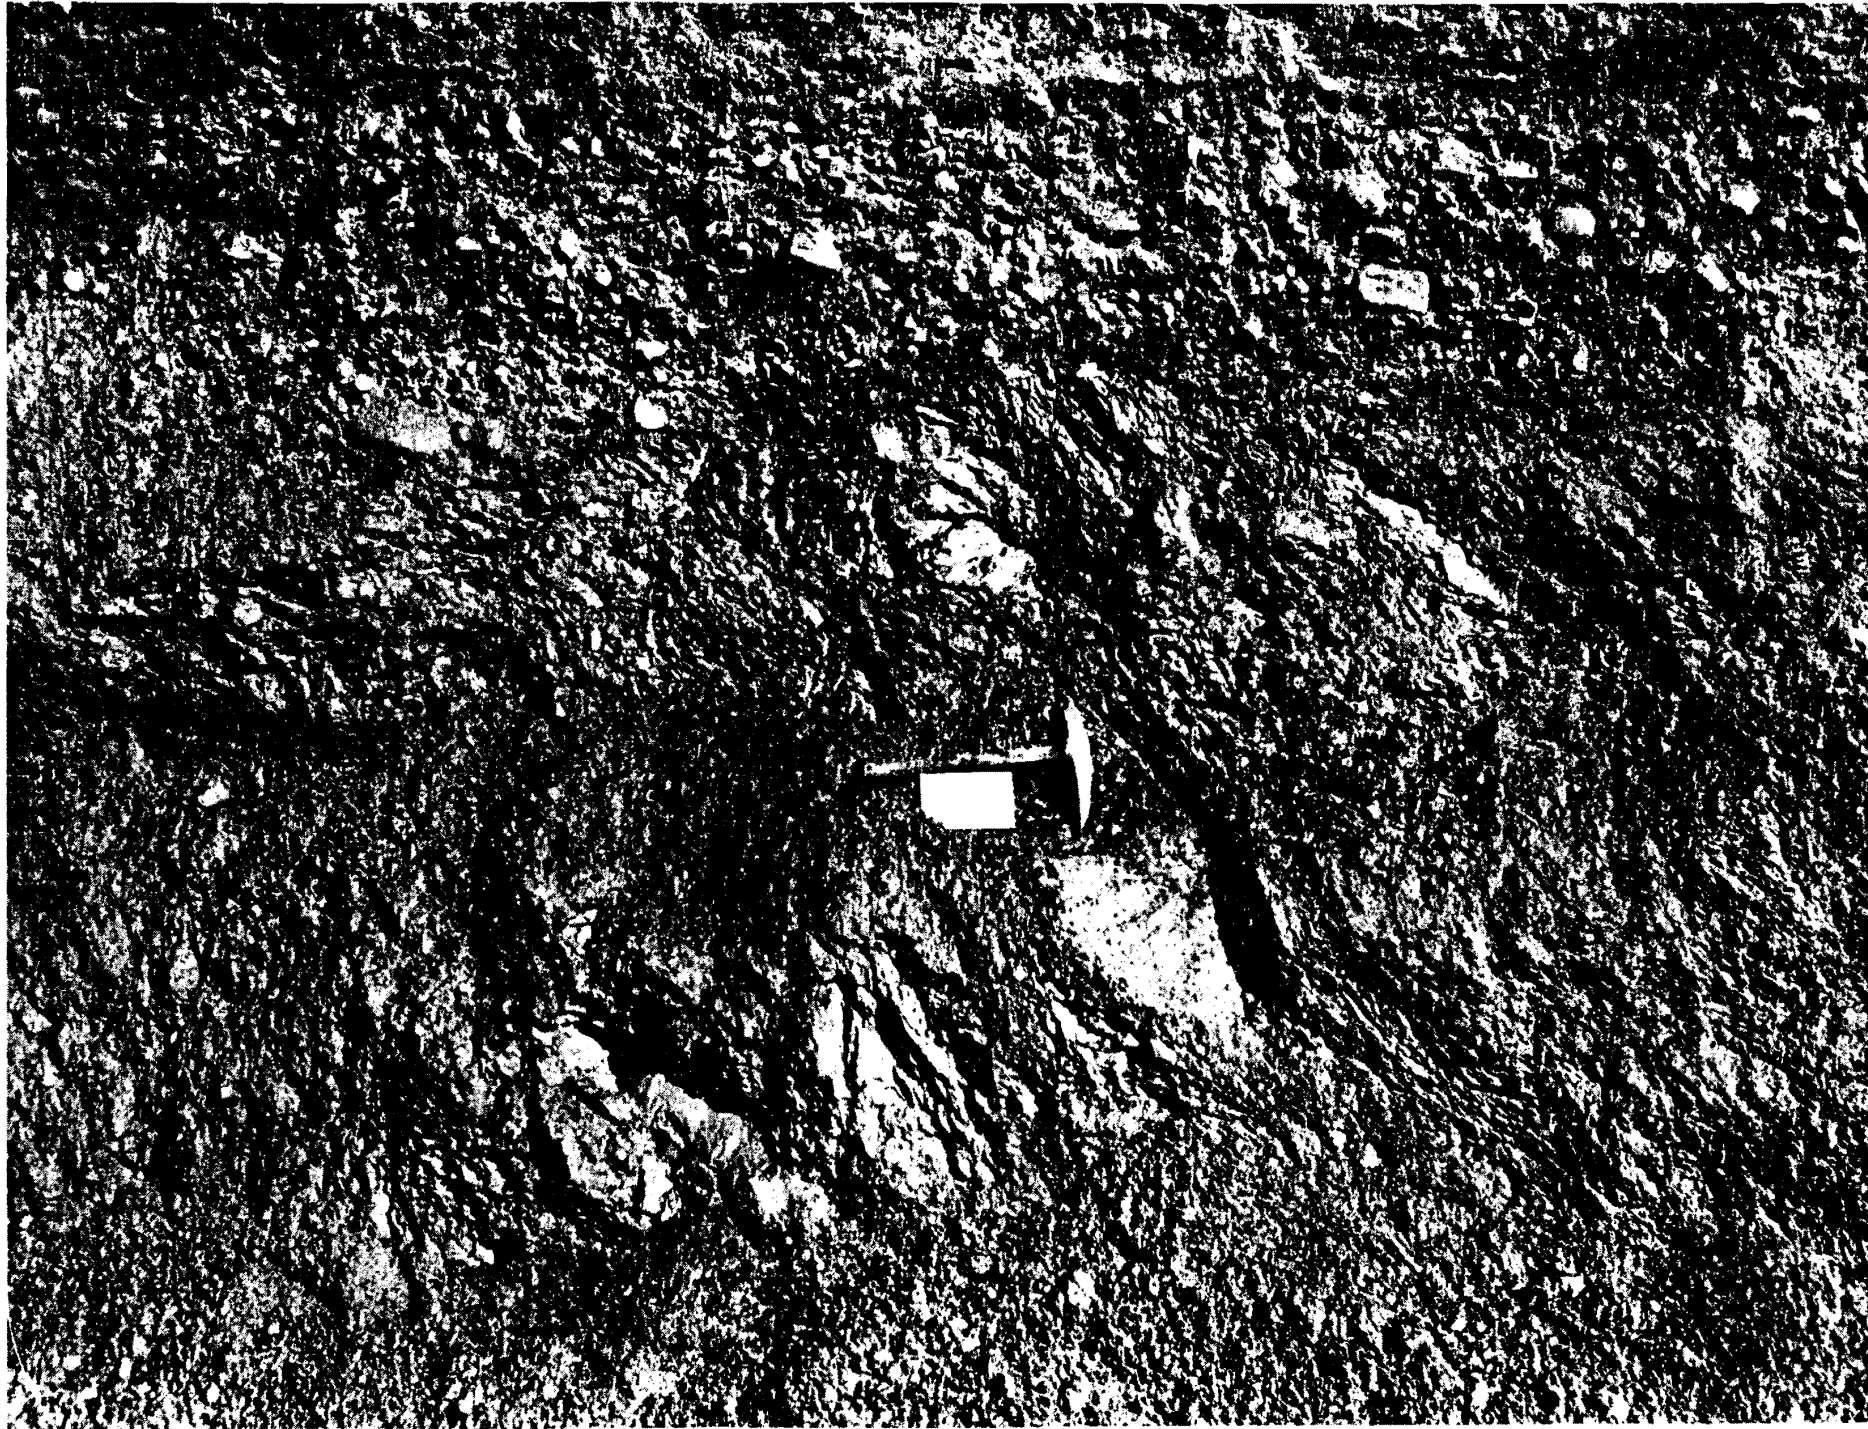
Fault in Reactor #2 Cavity Wall at Approximately 354 Degrees. Elevation 680.0 at Base. Viewed Southwest.
